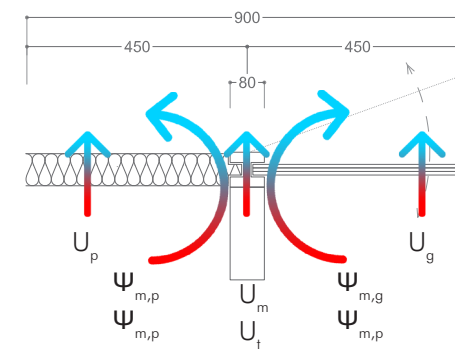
Enlarged plan view showing U & ψ - values exchange through typical curtain wall for proposed case (Source – Author)
